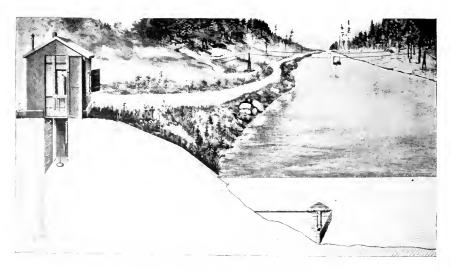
Photograph and Drawing of a Typical Gaging Station Layout
